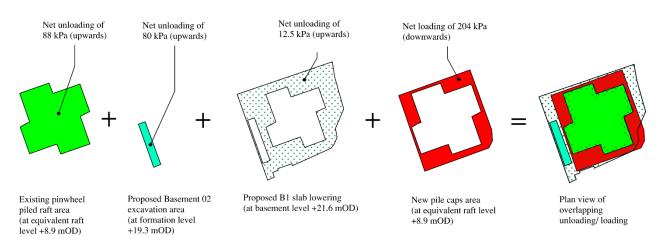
Net unloading/ loading applied in Oasys PDISP model, resulting from partial superstructure deconstruction, proposed B2 excavation, B1 slab lowering and new superstructure loading.
